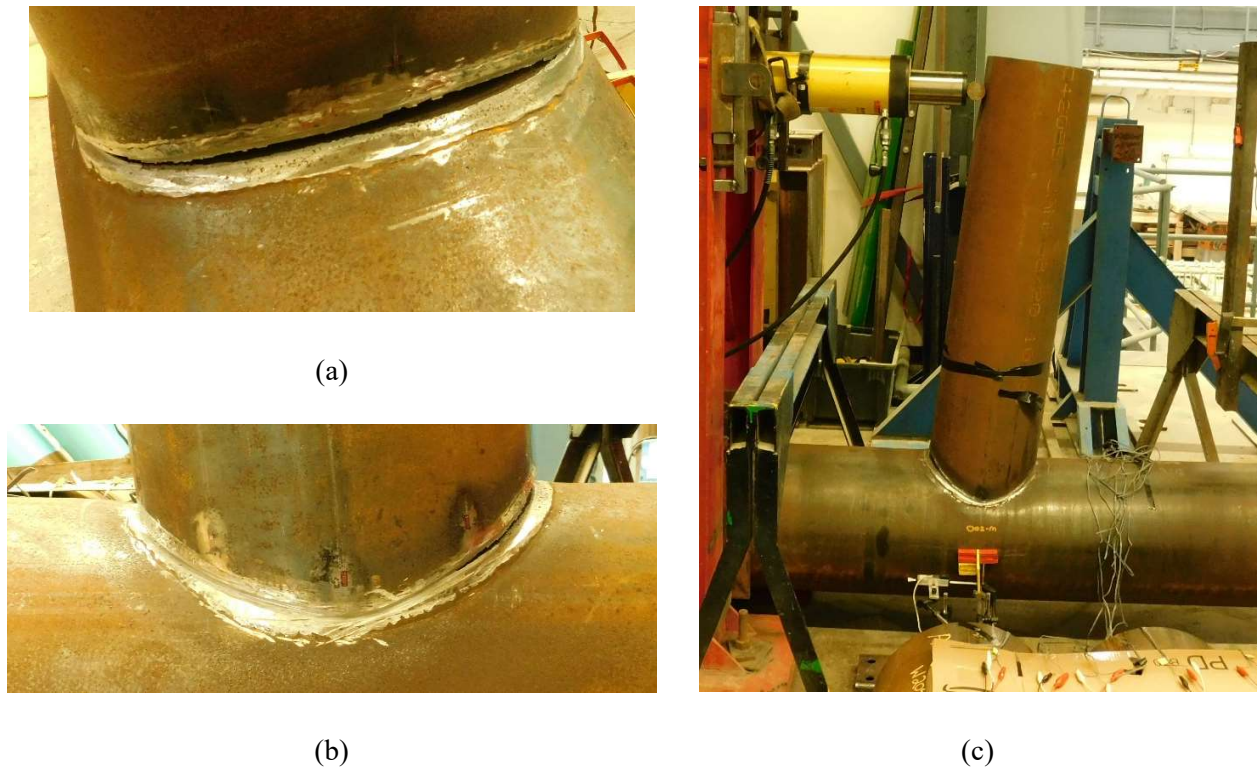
Failure of T406-324-1 (a) weld fracture, (b) chord deformation and (c) branch deformation
